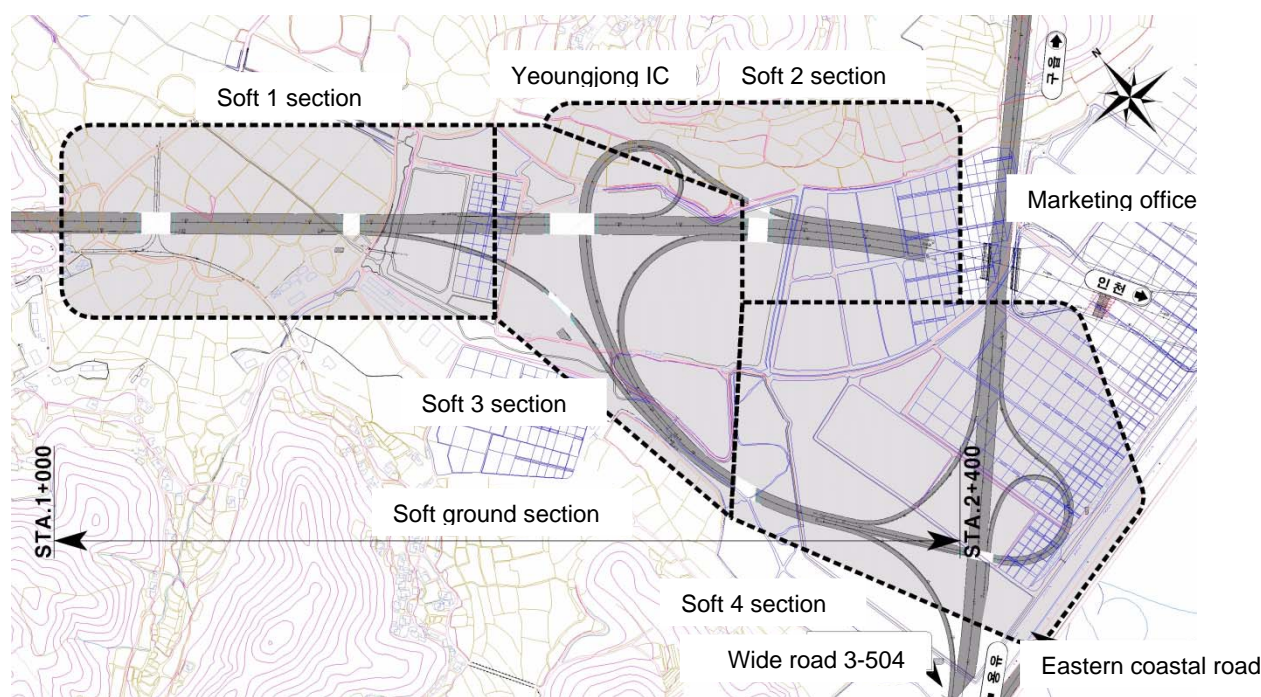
Soft Ground Zoning in the West Connecting Road of the Bridge
